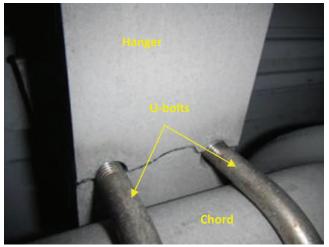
Cracked hanger at hanger to chord connection U-bolt
